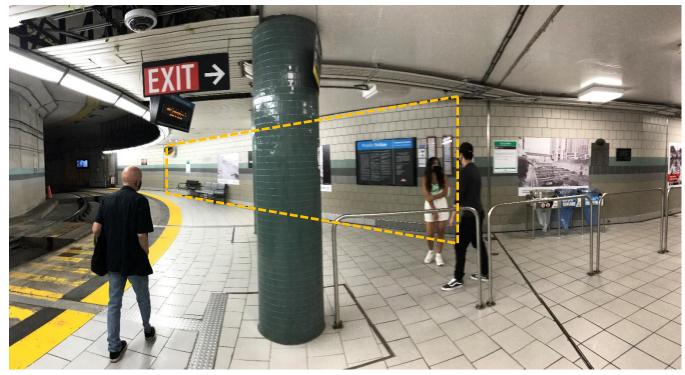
Approximate area of intervention in existing streetcar loop (proposed location of platform expansion, 'Stair N' and existing 'Elevator 13')
